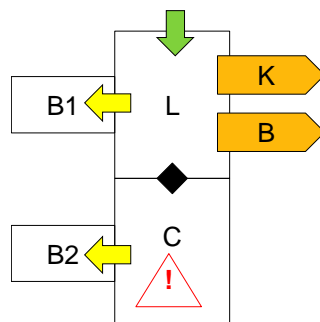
Floor plan configuration for which sufficient ventilation of the child's room (C) can be an issue
